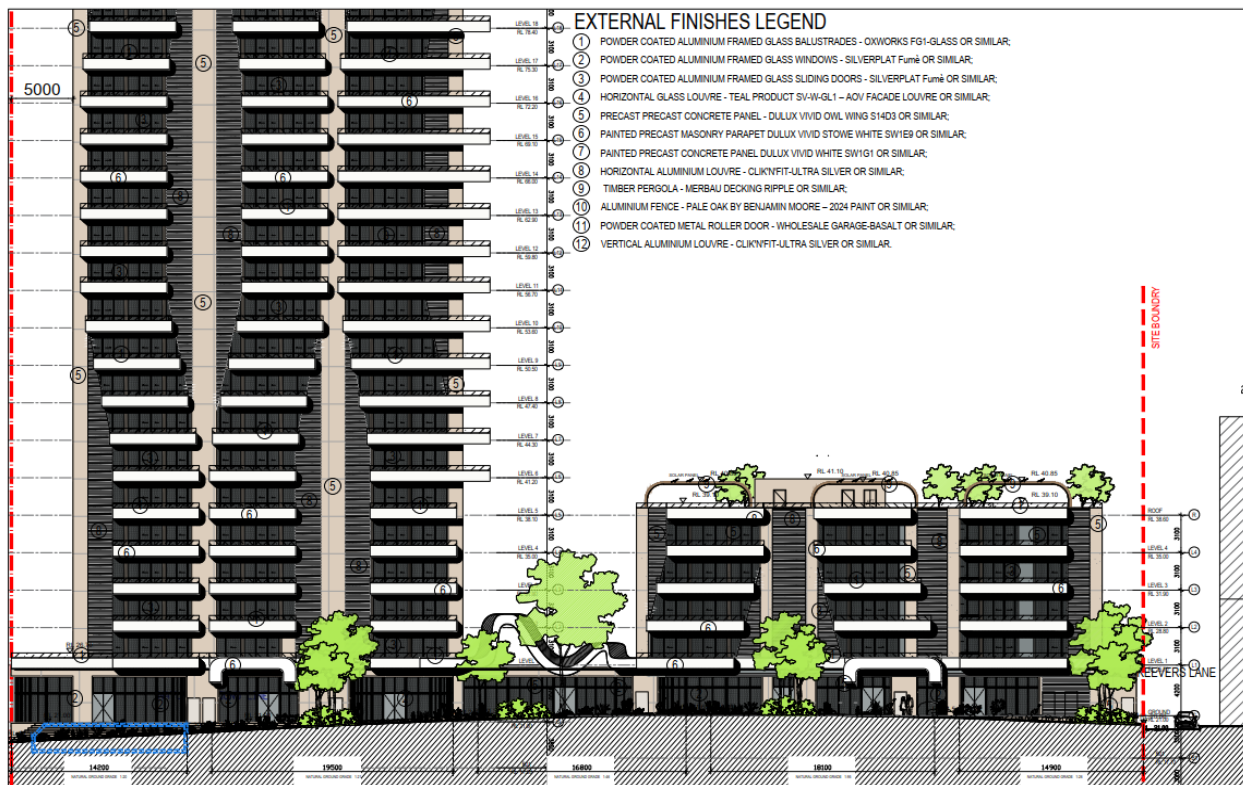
Tony Owen Partner's "West Elevation- Building B" Architectural Plan
